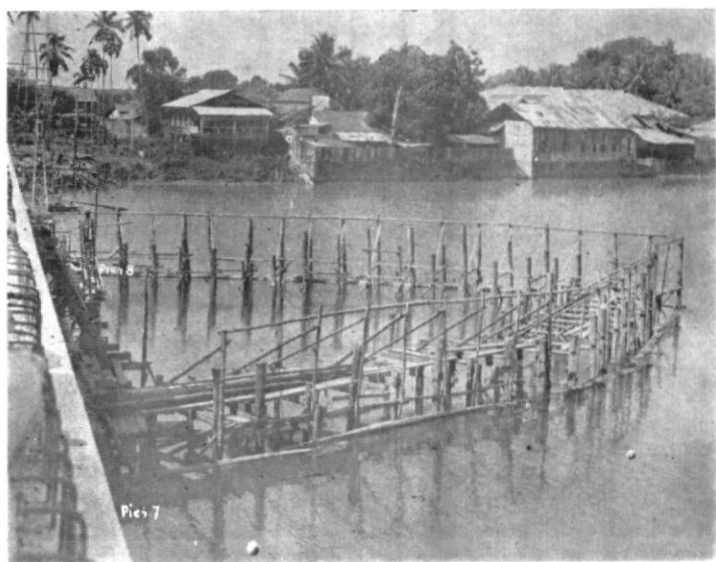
Fig. VII. 'Cut Water'—a device to protect the timber staging in the river between Piers Nos. 7 and 8 from the floods.
